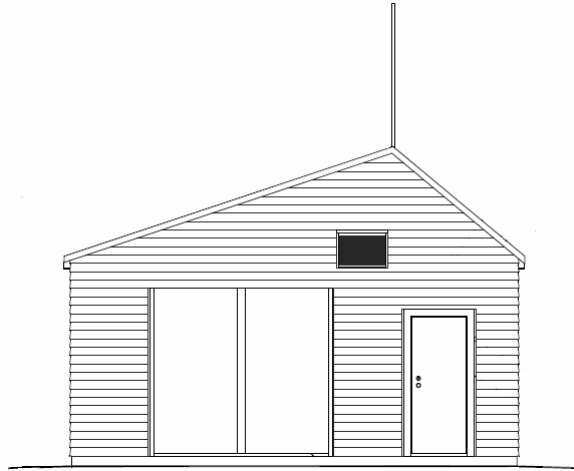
Atlanta test hut: East elevation (West similar)
